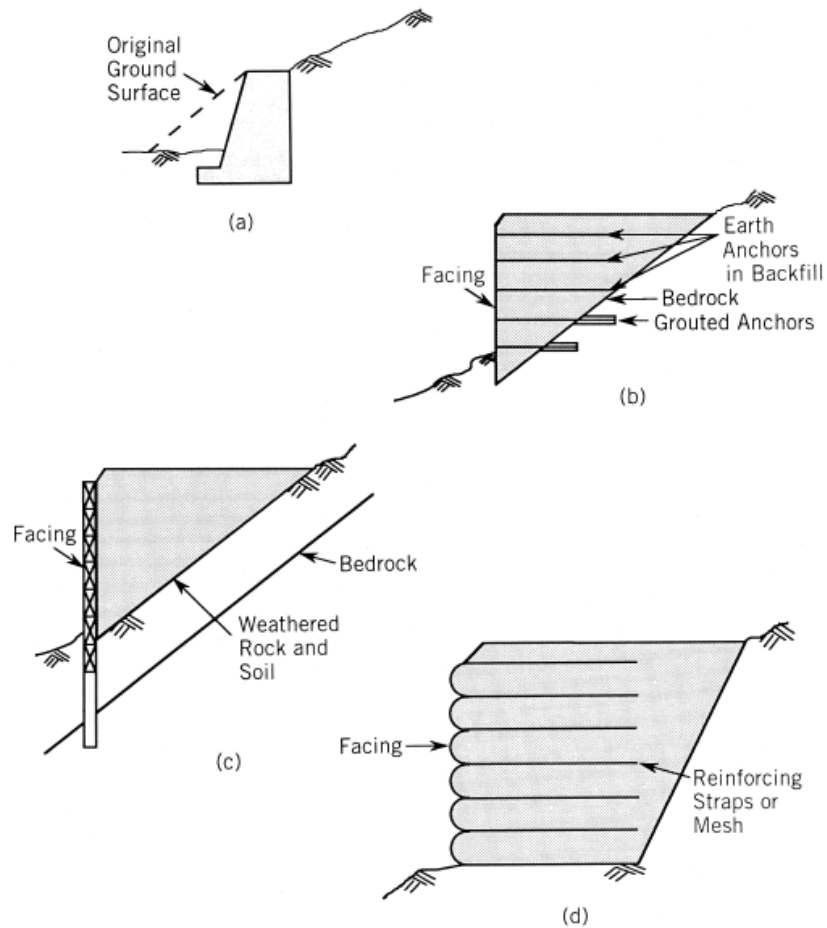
Types of retaining structures: (a) Gravity retaining wall. (b) Tieback retaining wall. (c) Sheet pile cantilever wall or soldier pile. (d) Mechanically stabilized embankment (Abramson et al, 2001)
